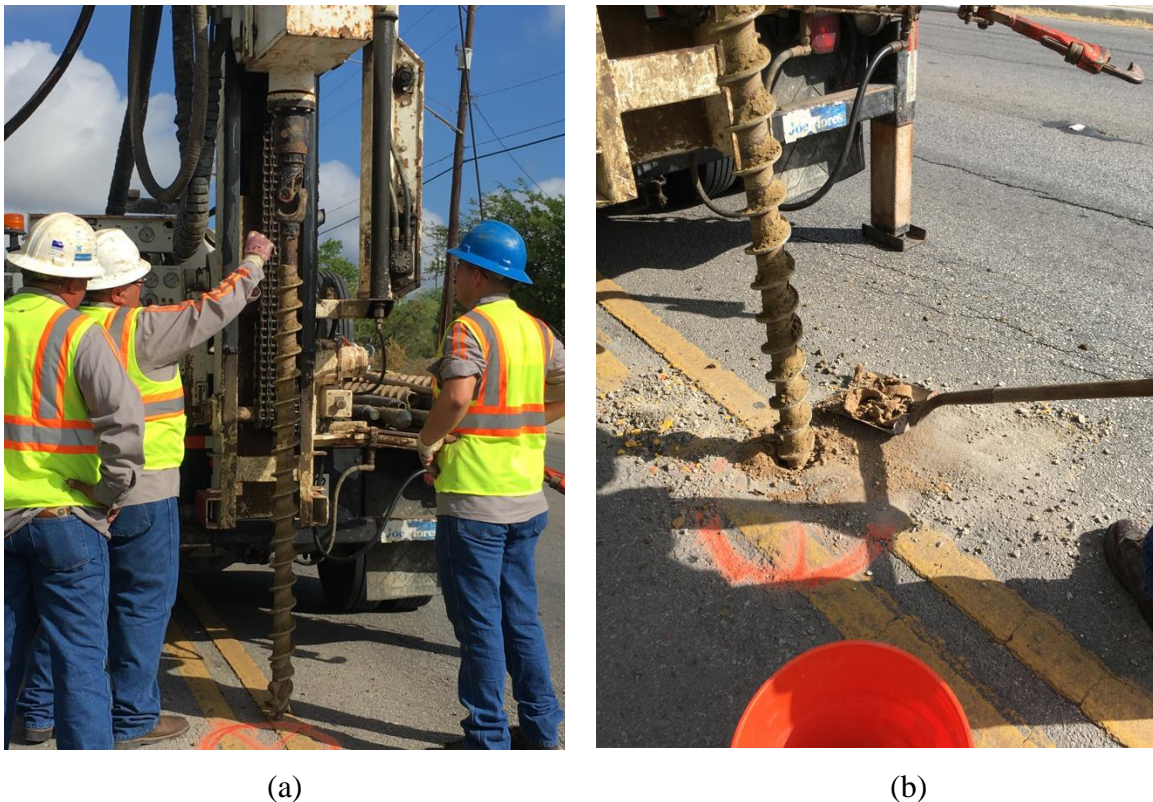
(a) Solid stem auger used to perform borings; (b) Samples being collected
